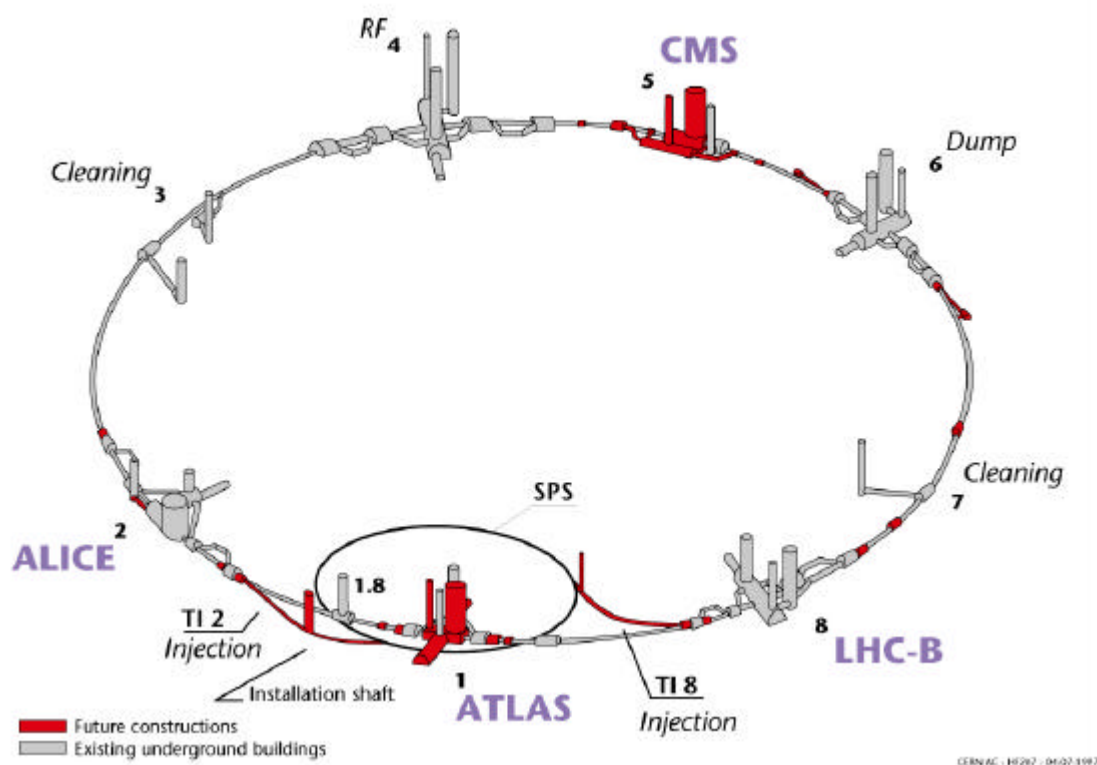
Layout of the CERN ring accelerators including the new connecting tunnels TI2 and TI8 (source: <http://acwebimages.cern.ch/>)
